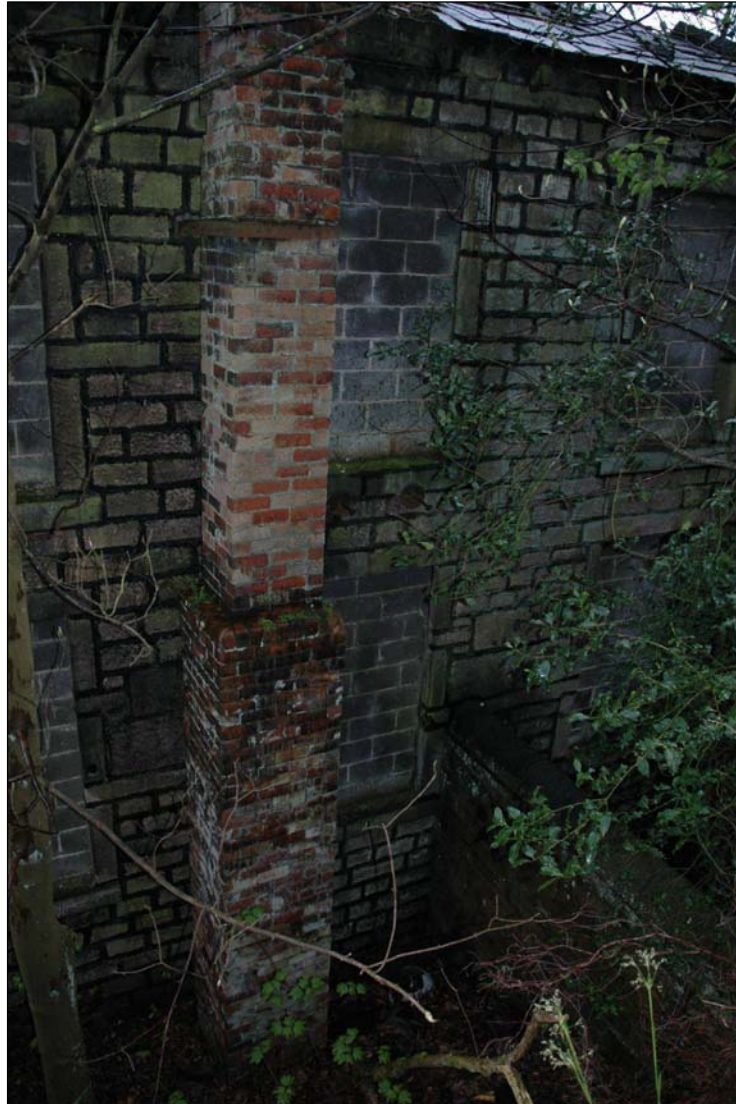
North facing elevation of building 1 looking south, note blocked windows and secondary added chimney stack (2005)
